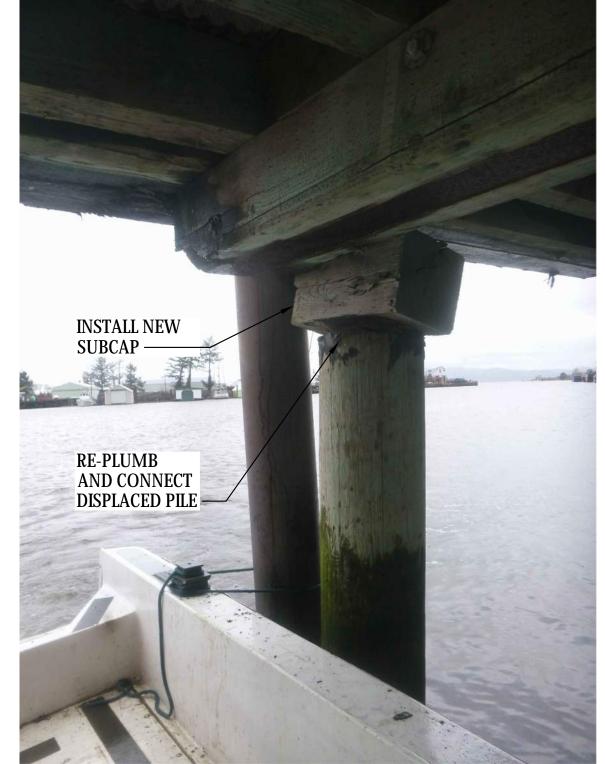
PHOTO - WORK PIER DISPLACED PILE AT WP13/A
